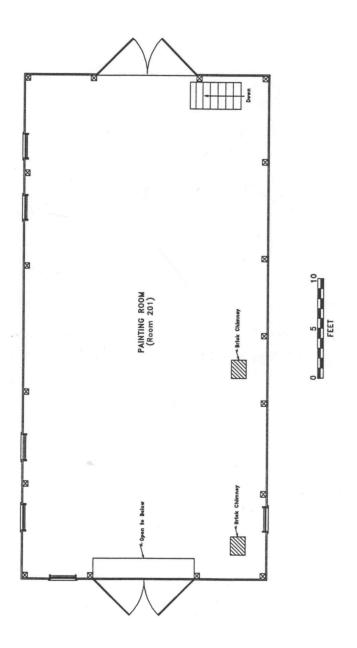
Second floor plan of the Baumbauer Blacksmith Shop, as originally constructed.
